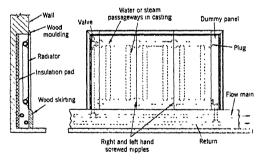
FLAT TYPE PANEL INSTALLED IN WALL RECESS
